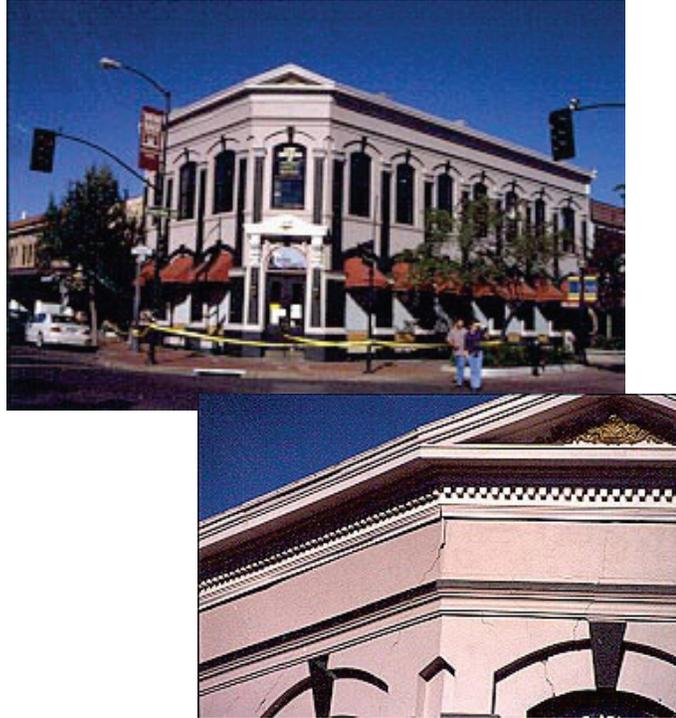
Photo of Building J4 and detail of damage after the 2000 Yountville earthquake (PEER, 2000).
